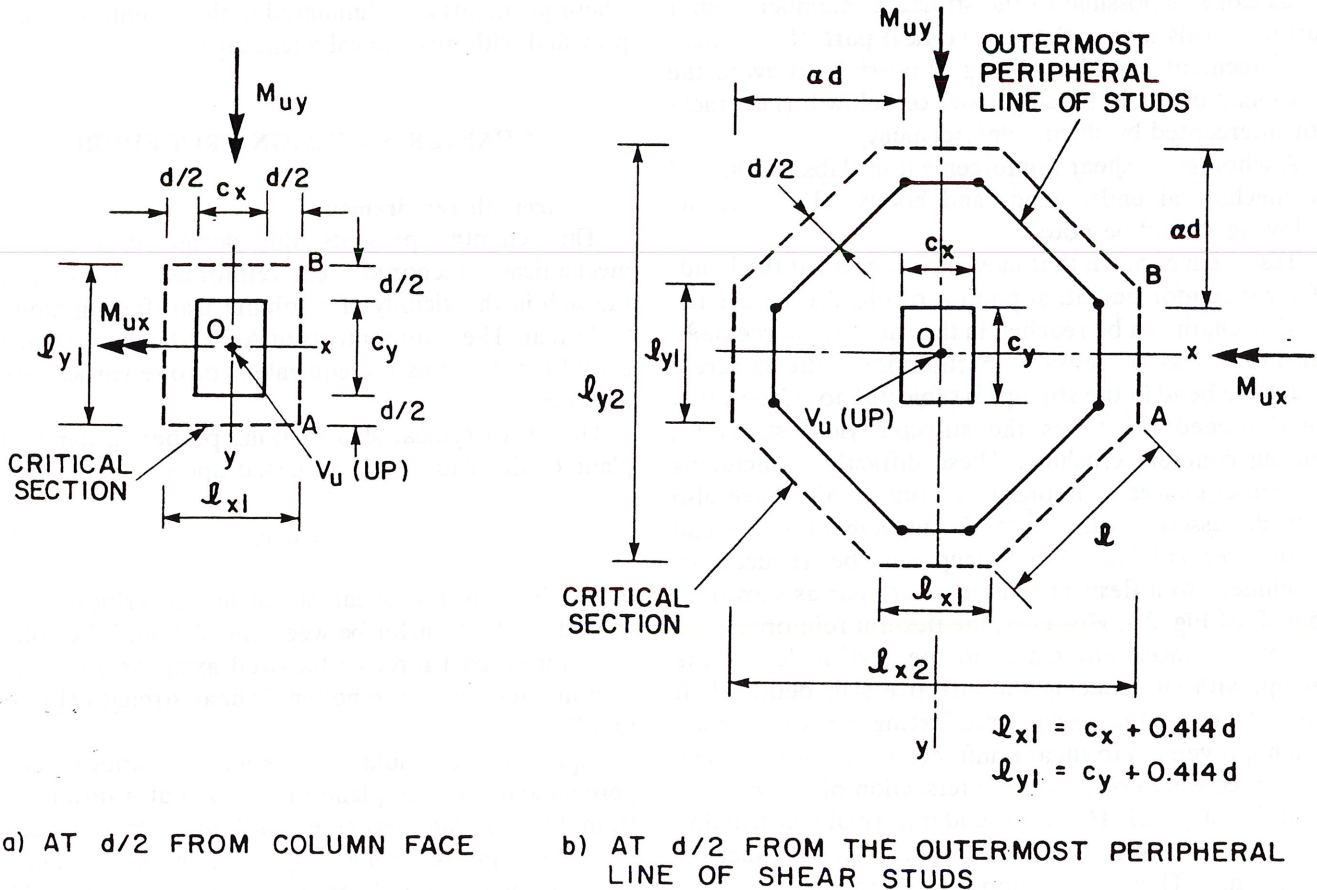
Critical sections for shear in slab in the vicinity of an interior column
